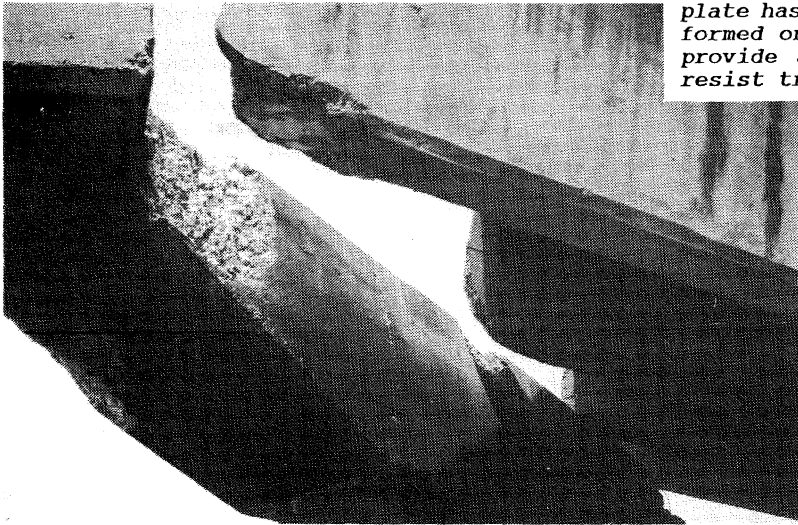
Rizal Canal Bridge; beams pulled away from the pier but still supported on far end cantilever section of pier. This cantilever section had failed in bending
